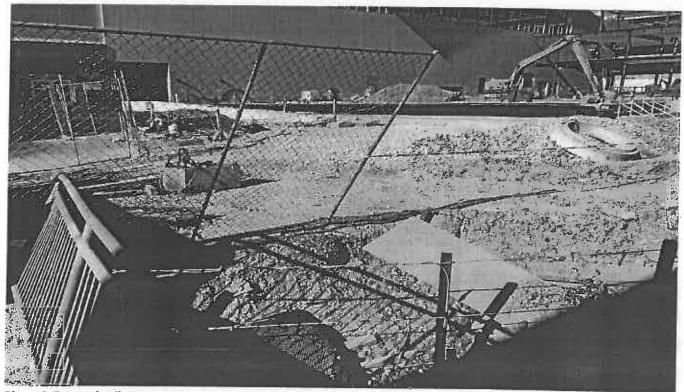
Exposed soil placed in position to pollute State waters via stormdrain in the event of rainfall North of the site.
